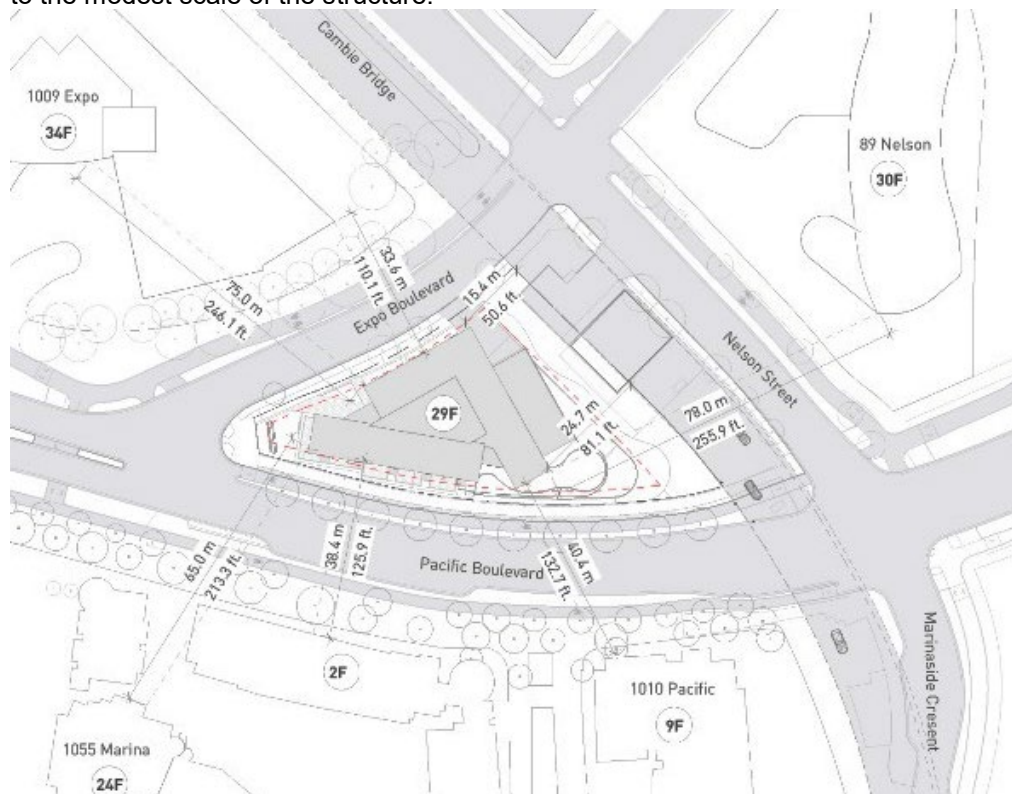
Building siting, orientation, tower floor plate, and tower separation
